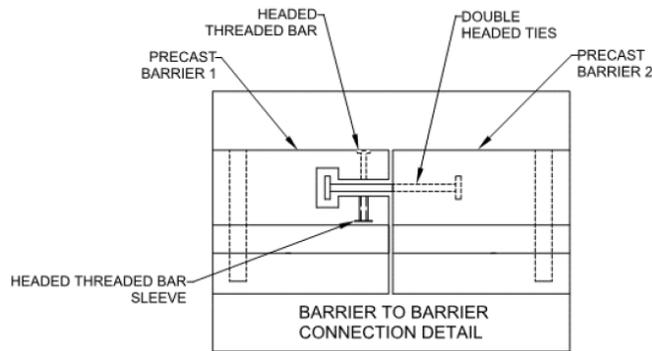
46 Plan view of the barrier-to-barrier connection [68].
